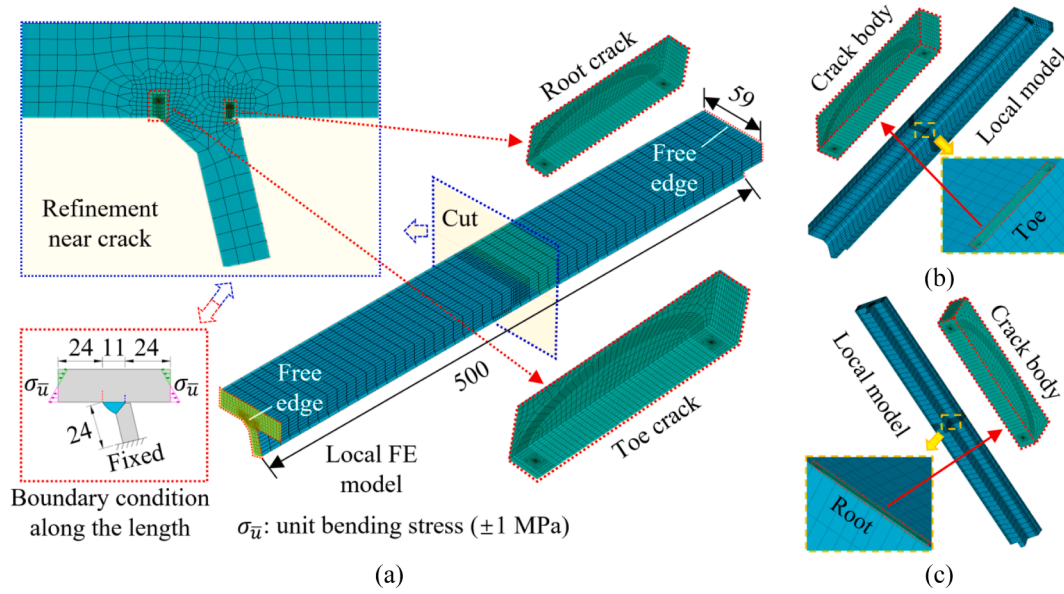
Local FE model of cracked RD joints: (a) Dual-cracks; (b) Toe crack; (c) Root crack.
